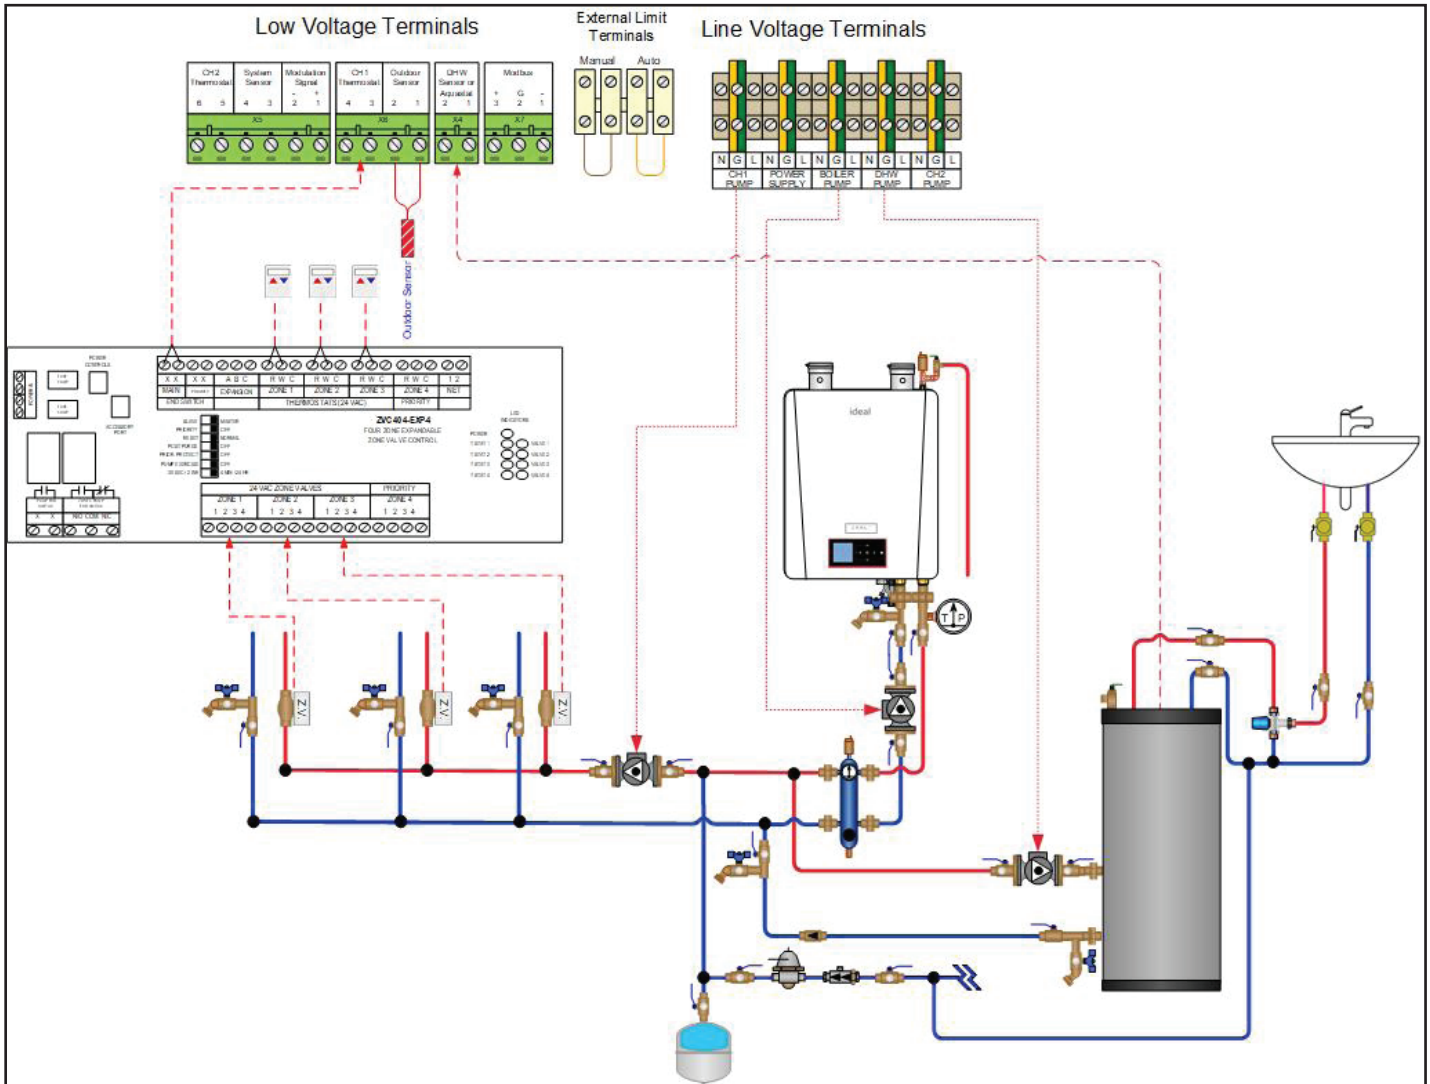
Exalt Solo - Piping with Zone Valves and Zone Valve Control Panel
